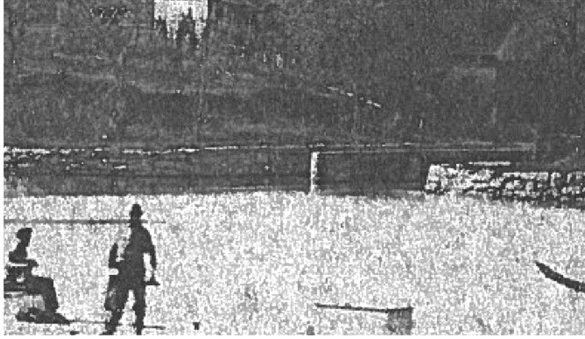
Enlargement of the 1866 Photo with the Gauge Dock in the background. Note the wall in the center of the tail race, and the slope of the grade behind the south bank wall,
